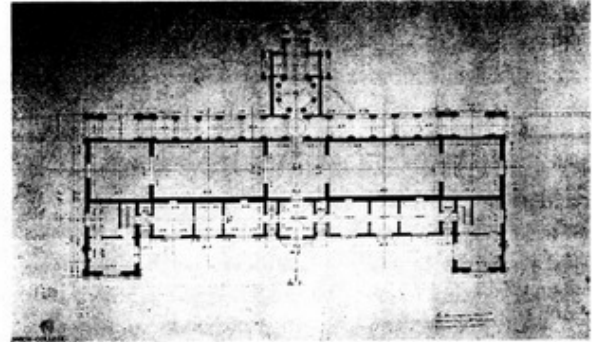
Dulwich Picture Gallery. Plan without fireplaces in gallery. Dated 19 July 1811, this is the final extant plan before construction began. The Mausoleum was switched from the building's east front to its west in November 1811, after the foundation was started. Other more minor variations were made as well (by courtesy of the Trustees of Sir John Soane's Museum).
